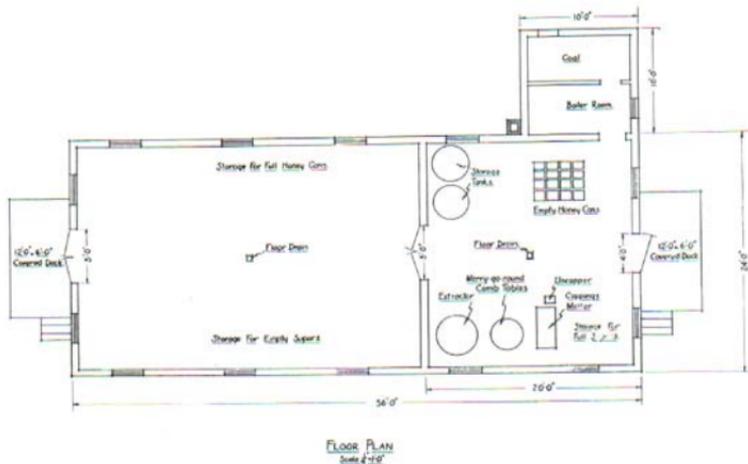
Honey house plan for medium to large outfit desiring single-story building.
